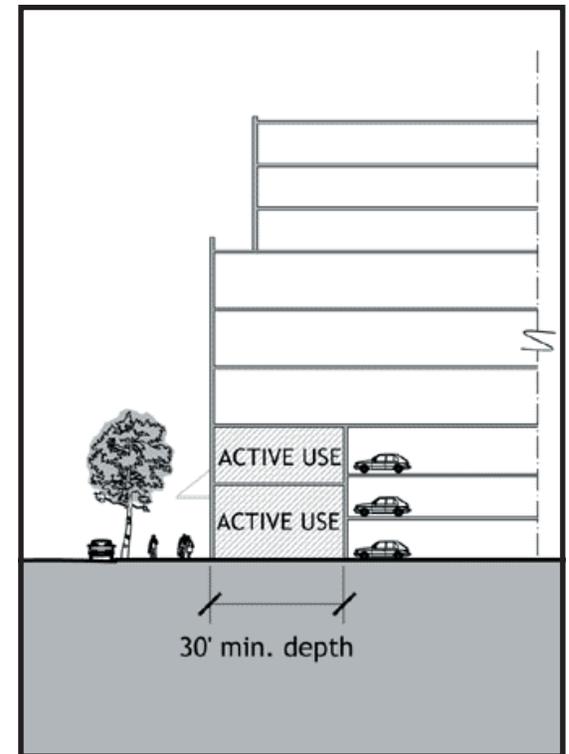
Section showing active use on street frontage; parking garage is not visible from the street
